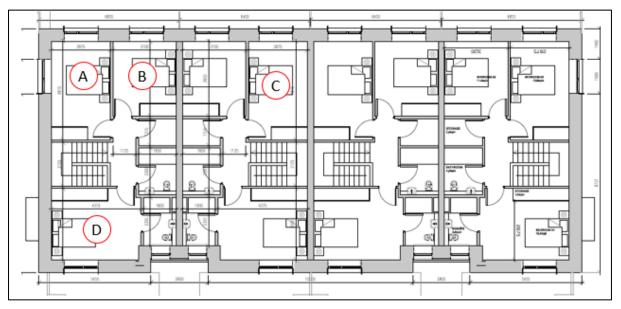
Blocks B6 – Second Floor Assessed Rooms
